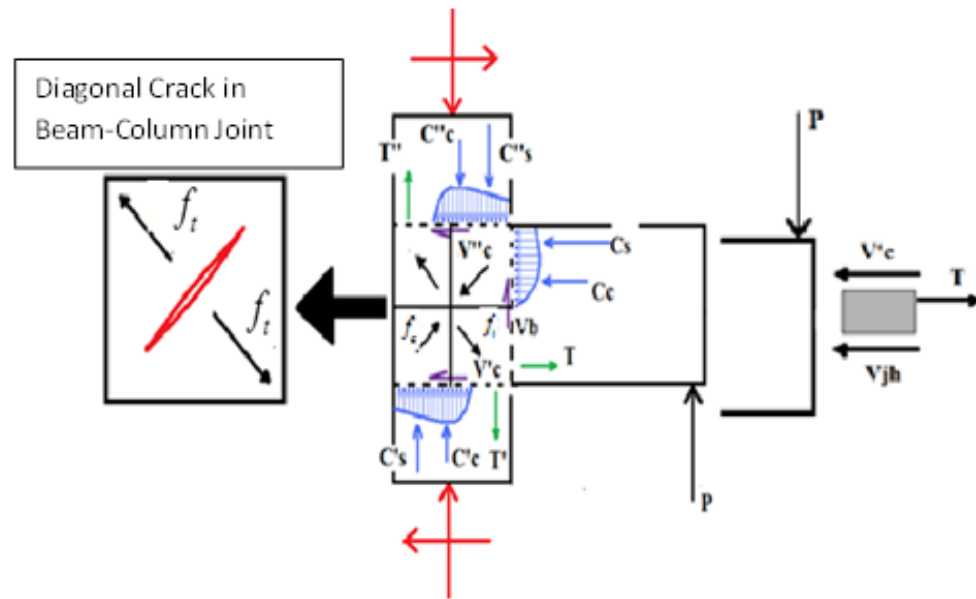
Diagonal crack in beam-column joints on load reversal
